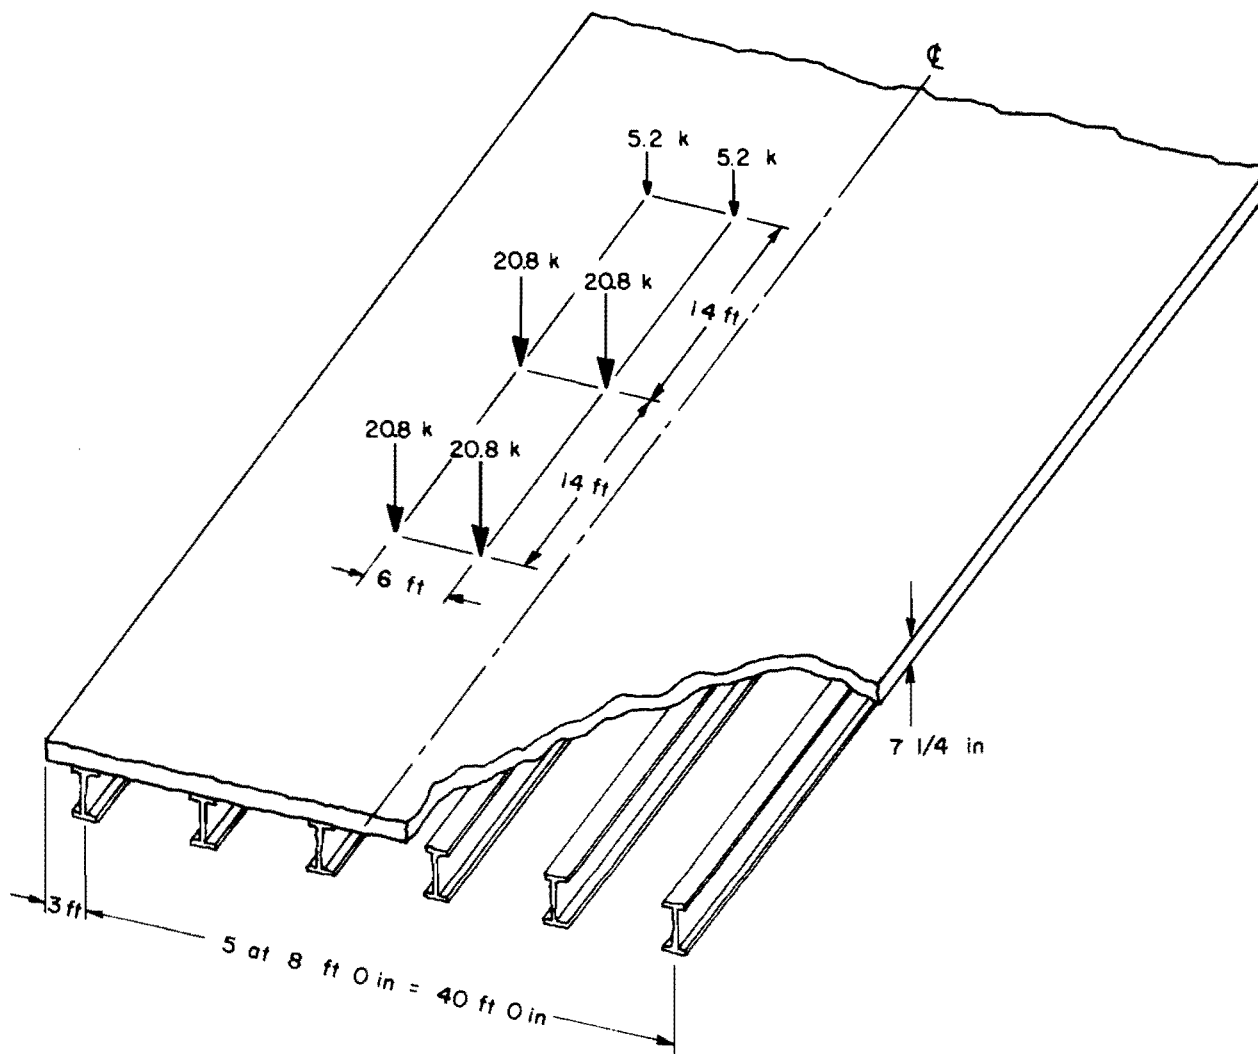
A typical one-way bridge deck reinforced perpendicular to traffic.
